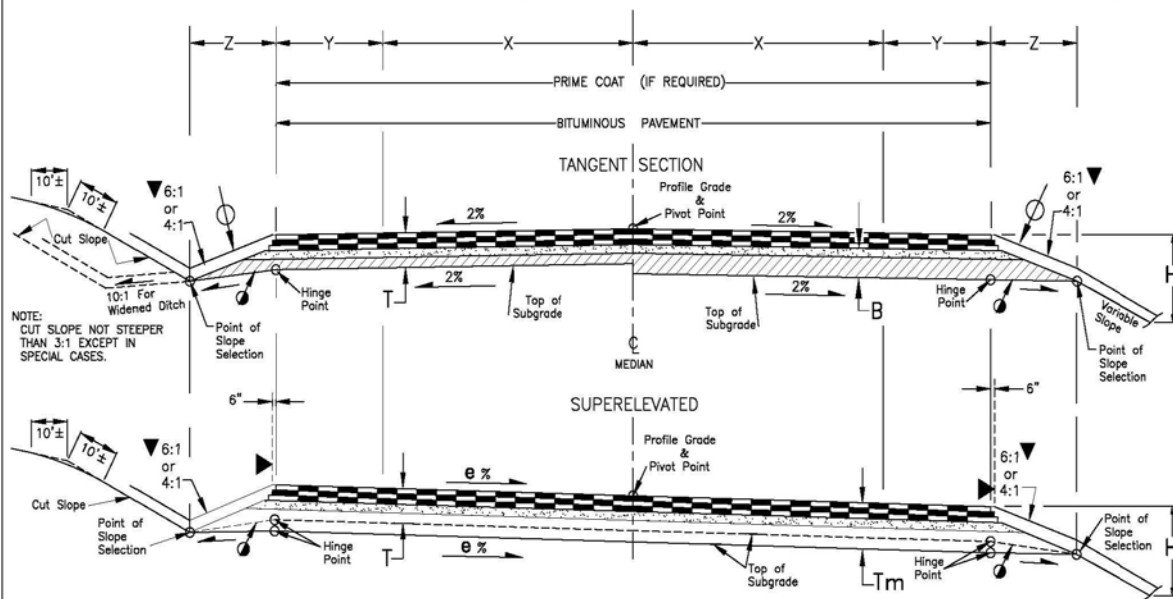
Typical Sections for Urban Bituminous or Concrete Pavement
